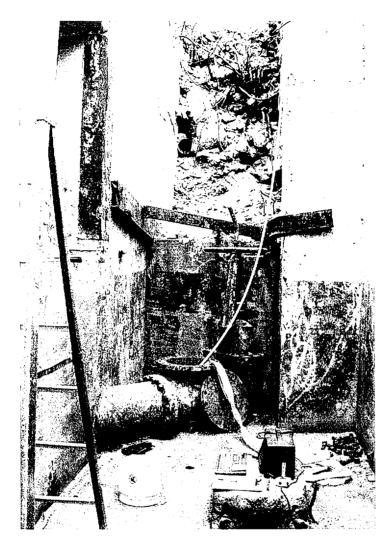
Center Yard Drain Pipe, Excavated Behind Garage (foreground)
